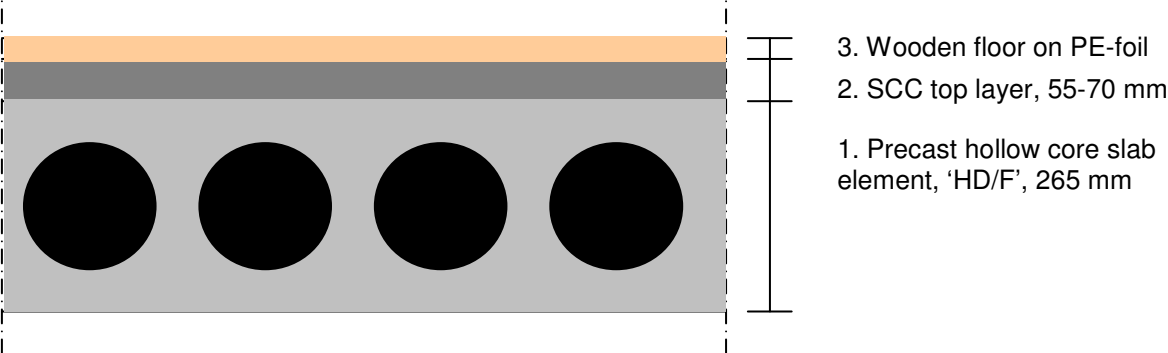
Cross-section of the investigated type of structure, i.e. top-layer of SCC cast in-situ on precast hollow-core slab.
